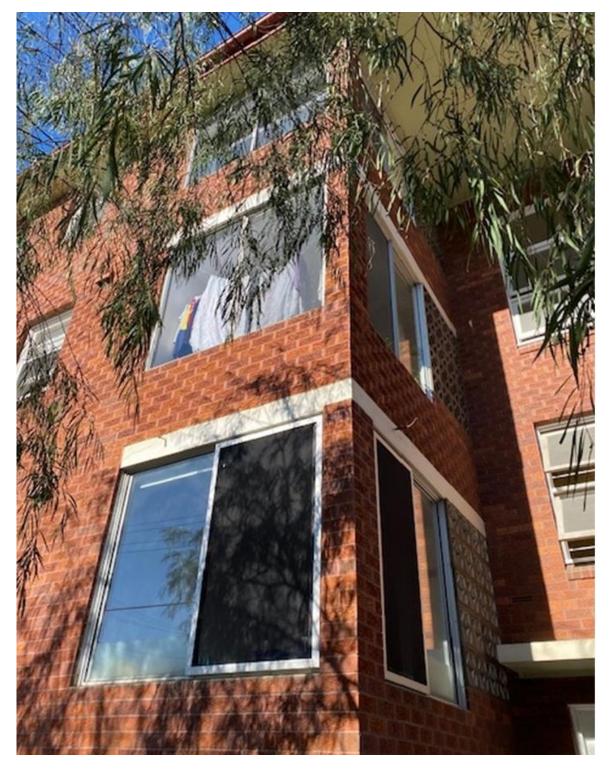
Other existing enclosed balconies within the Meek Street elevation.
